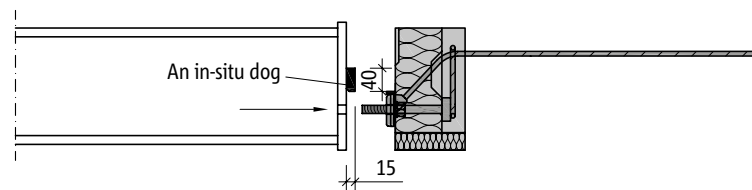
Assembly of the steel girder to the Schöck Isokorb®
